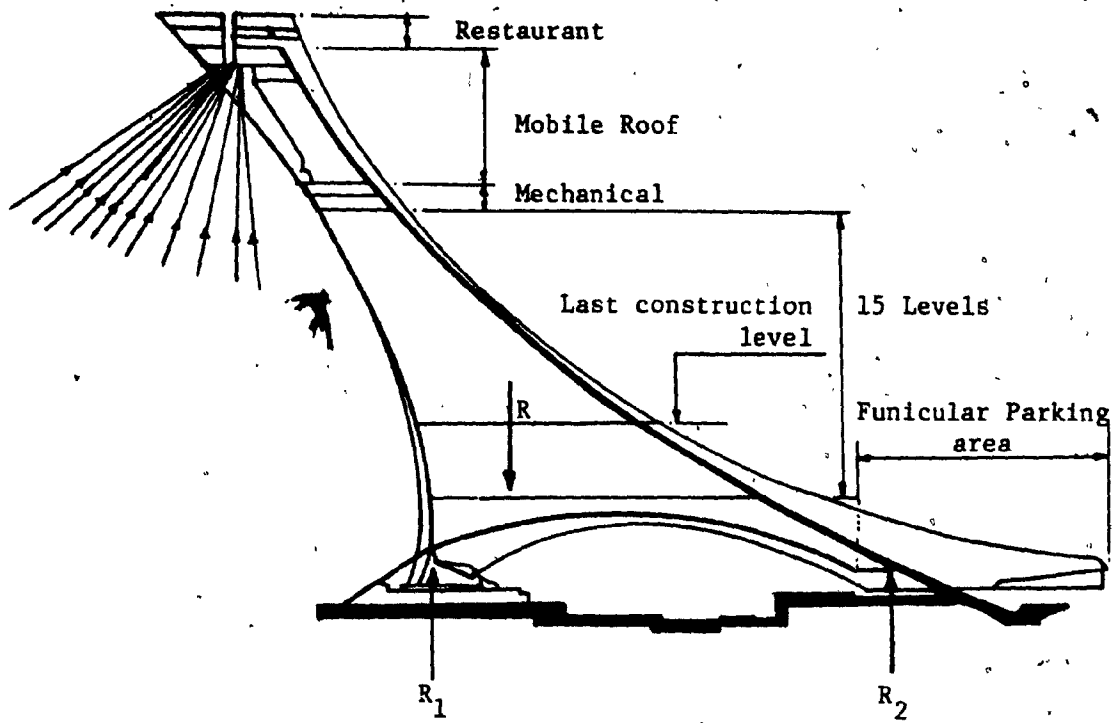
Plan and cross-sectional view of tower with loadings and reactions.
